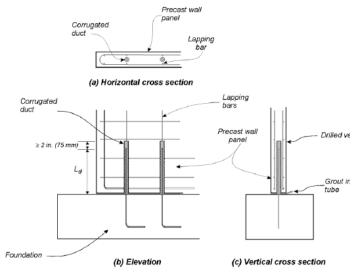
Wall-foundation beam connection through grouted ducting
